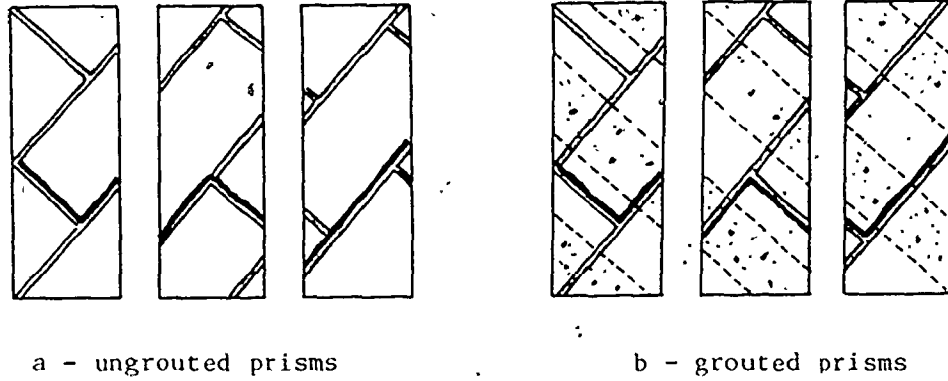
FAILURE PATTERNS OF UNGROUTED AND GROUTED MASONRY PRISMS UNDER OFF-AXIS TENSION
